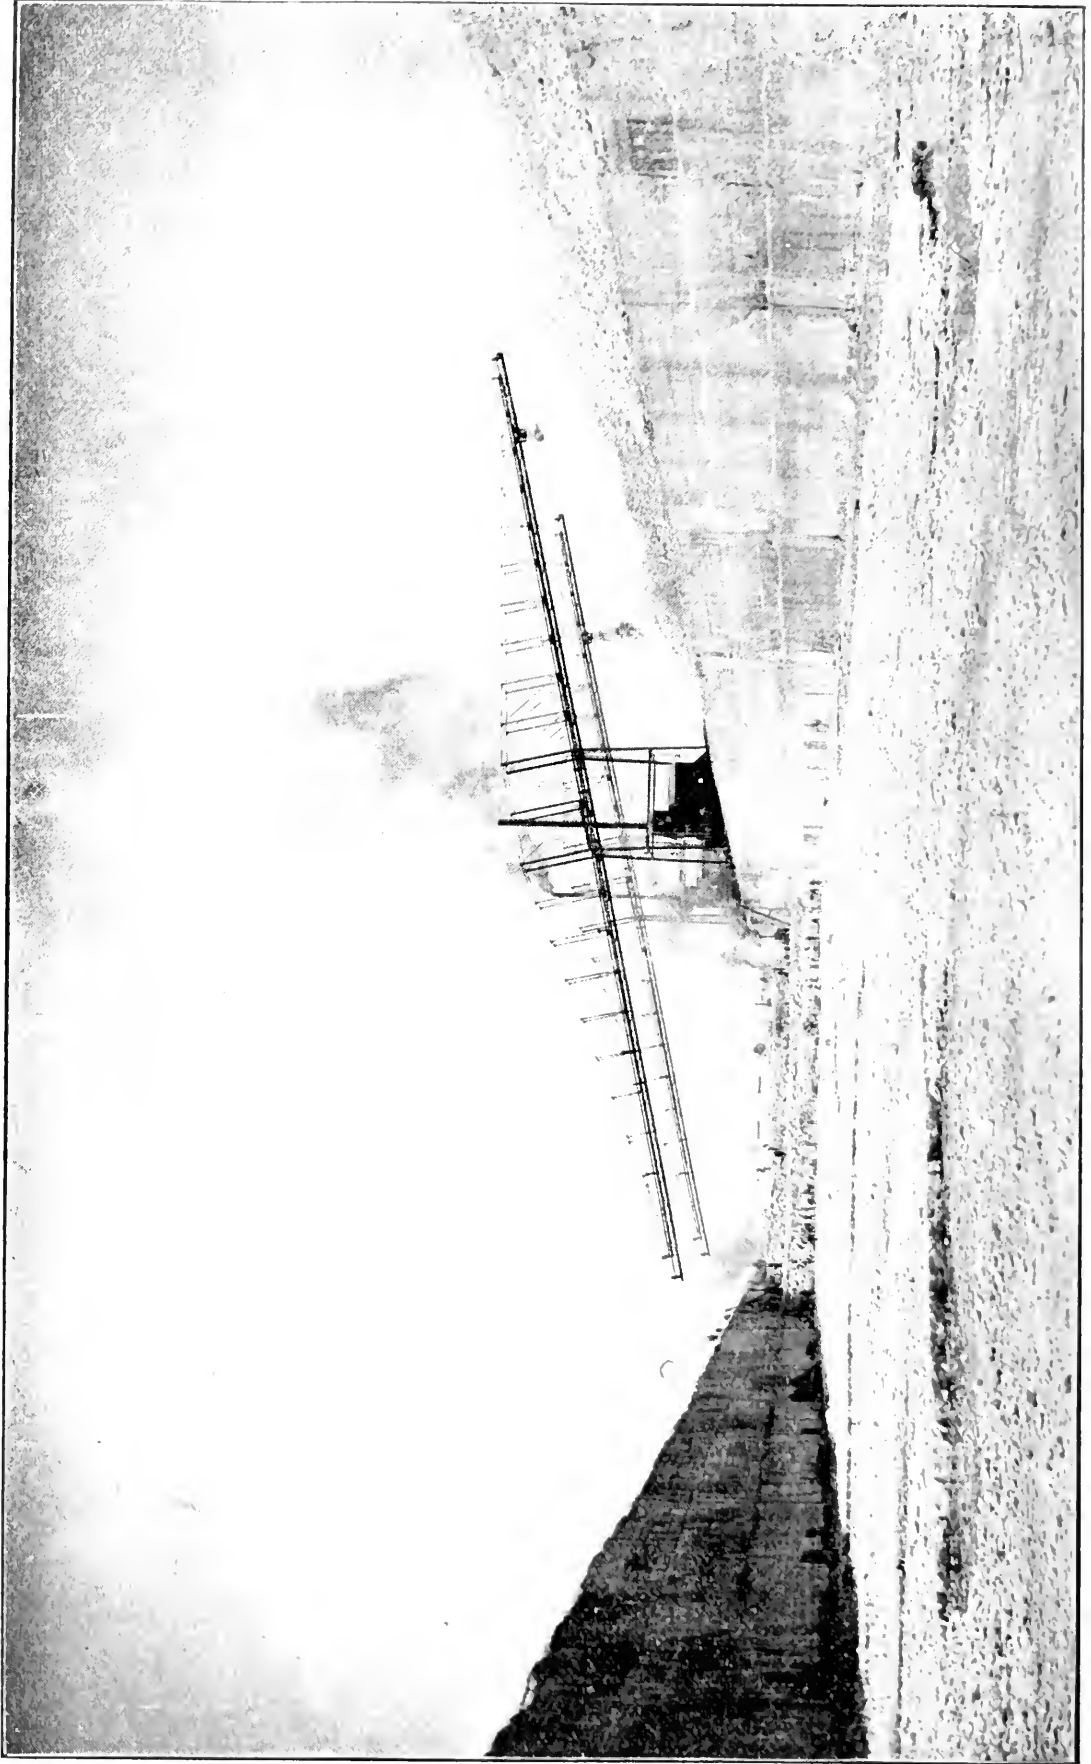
THE BROWN CANTILEVER CONVEYOR; ALSO COMPLETED PRISM OF CHANNEL, ROCK CUT BEING 35 FEET.
